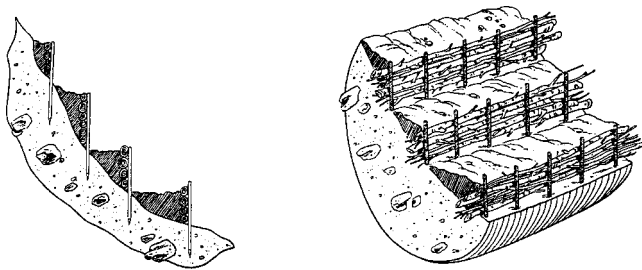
Wattle fences are short retaining walls constructed of living cuttings. They are used to provide slopes, which will support plant growth where oversteepened slopes are preventing plant establishment. The section shows the effects of steeper slopes on wattle fence spacing.
